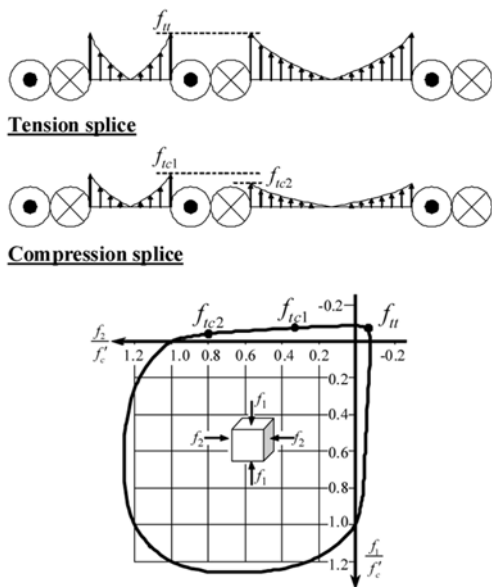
Tensile stresses on the surrounding concrete of spliced bars
